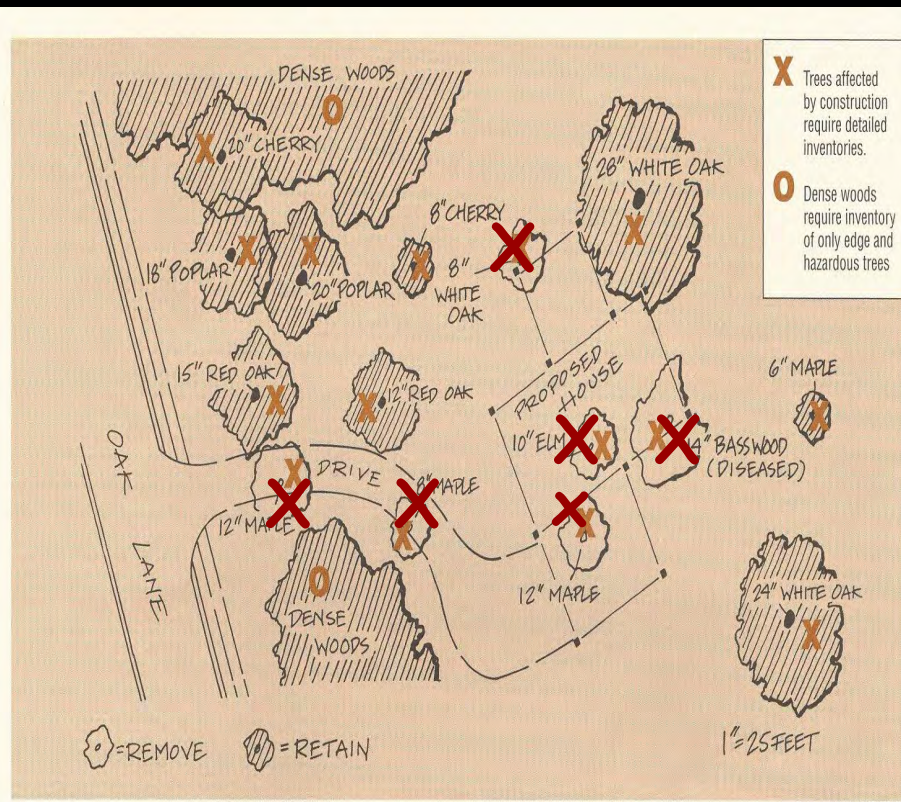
A simple tree preservation plan shows the location of house, driveway, and trees to be removed, encroached upon, and retained.
